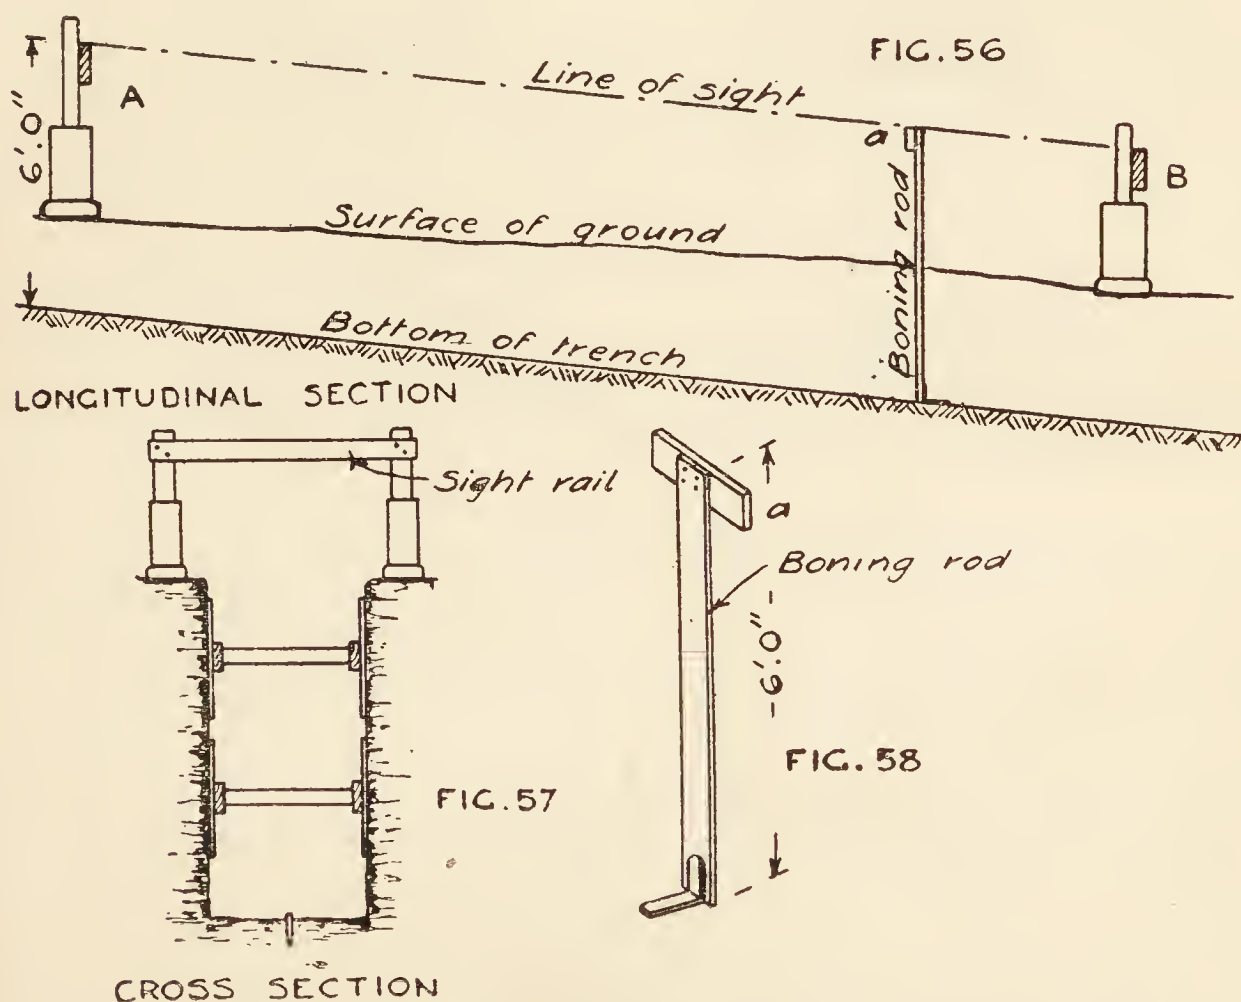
Longitudinal section of trench showing sight-rails and boning-rod.
